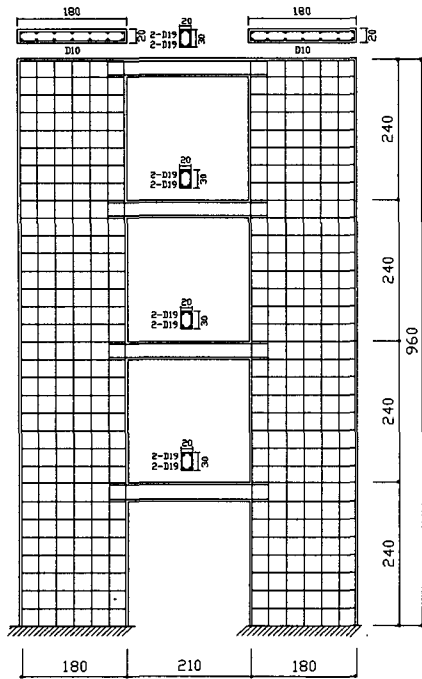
4-Story R/C coupled wall structure. (unit : cm)
